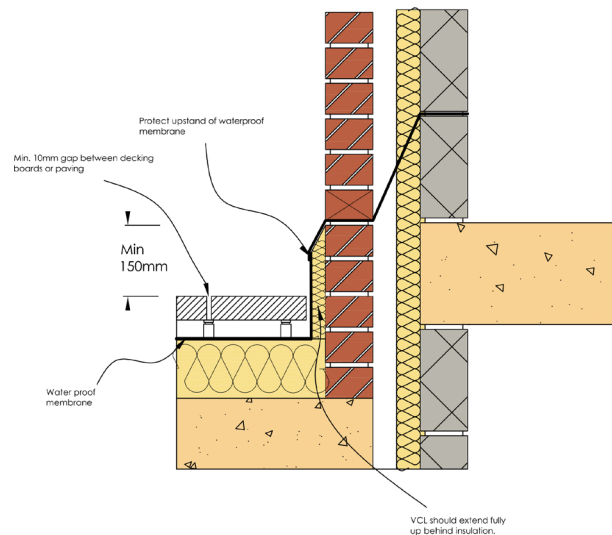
Upstand to decking and paving finishes e.g. balcony parapet
